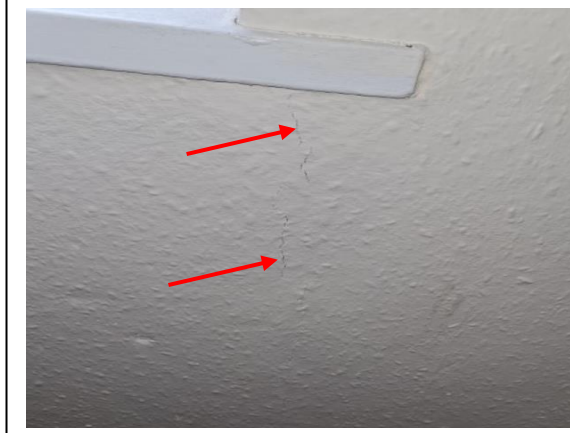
Flat 20 – Front Left Bedroom - Cracking Below LHS of Window
